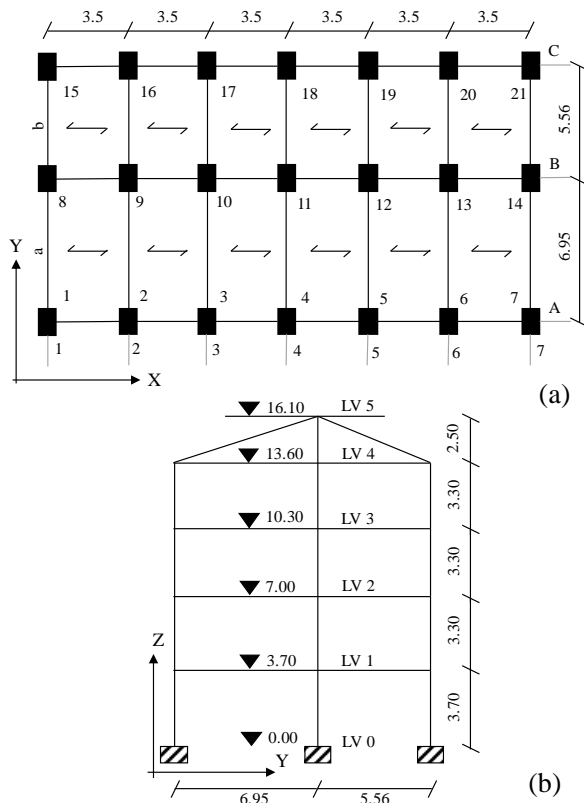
Building geometry: (a) plan view; (b) elevation view. Dimensions in meters.
